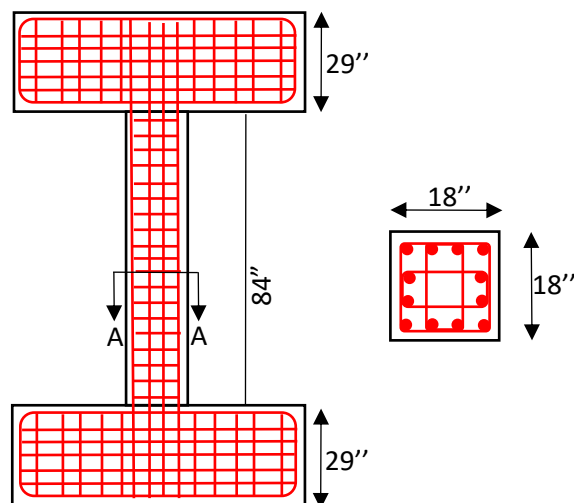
Vertical Section of Sokoli and Ghannoum (2016) and Geometry of Cross-Section
